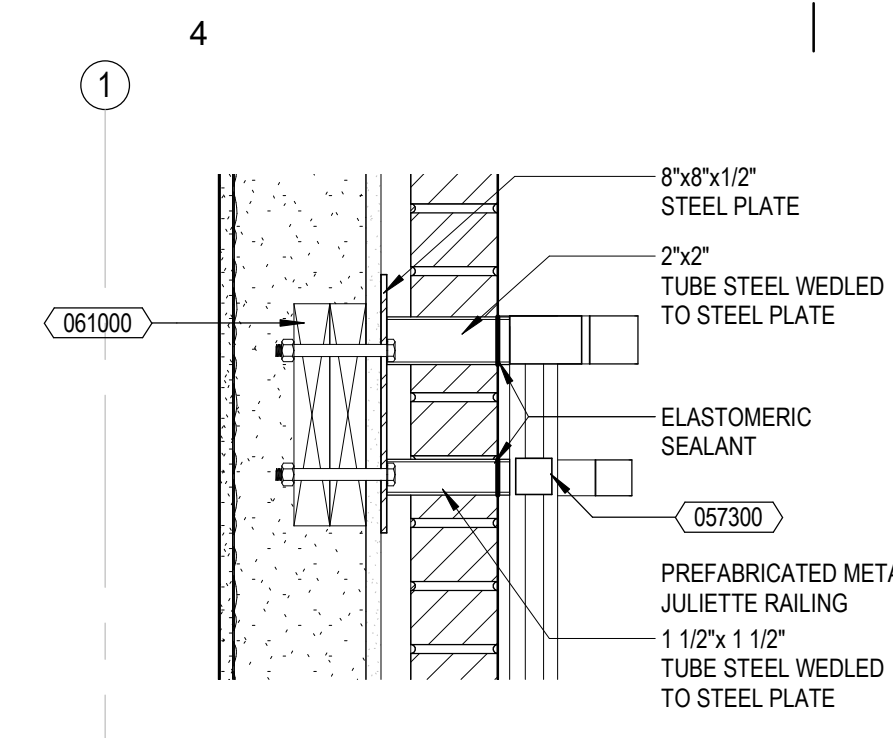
DETAIL- JULIETTE BALCONY CONNECTION AT CONCRETE PODIUM
